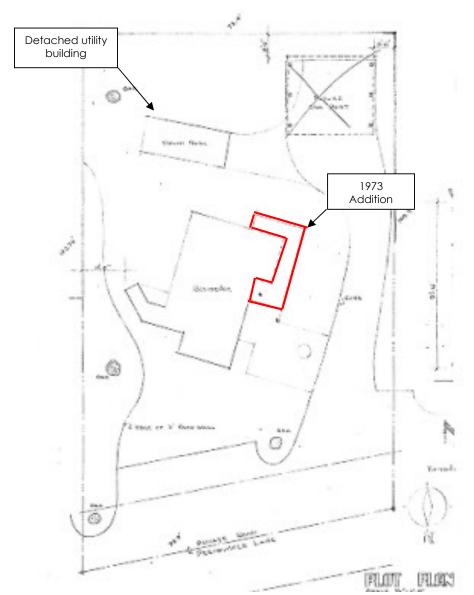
, 1973 Site plan showing new addition to former studio (now house)
